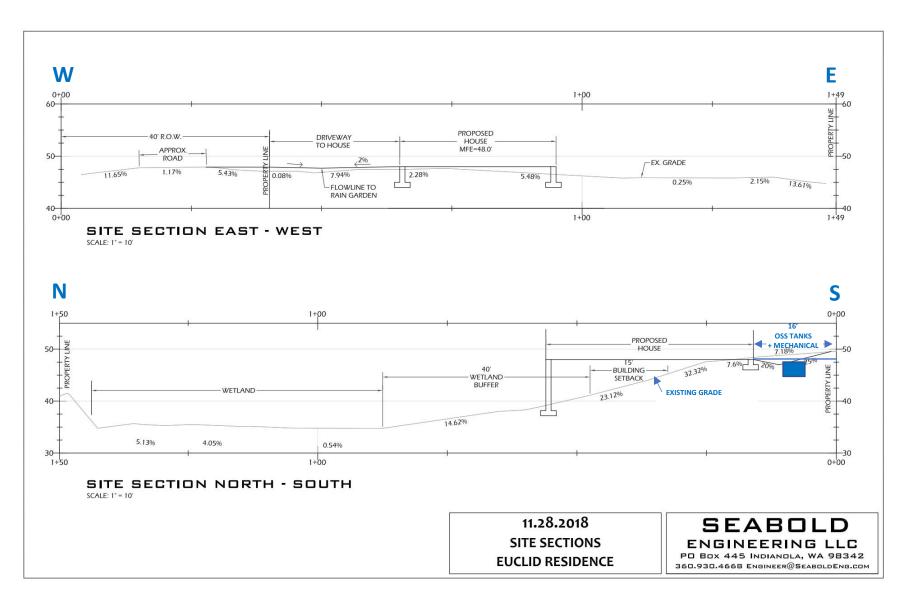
PROPOSED SITE DEVELOPMENT CROSS SECTIONS
